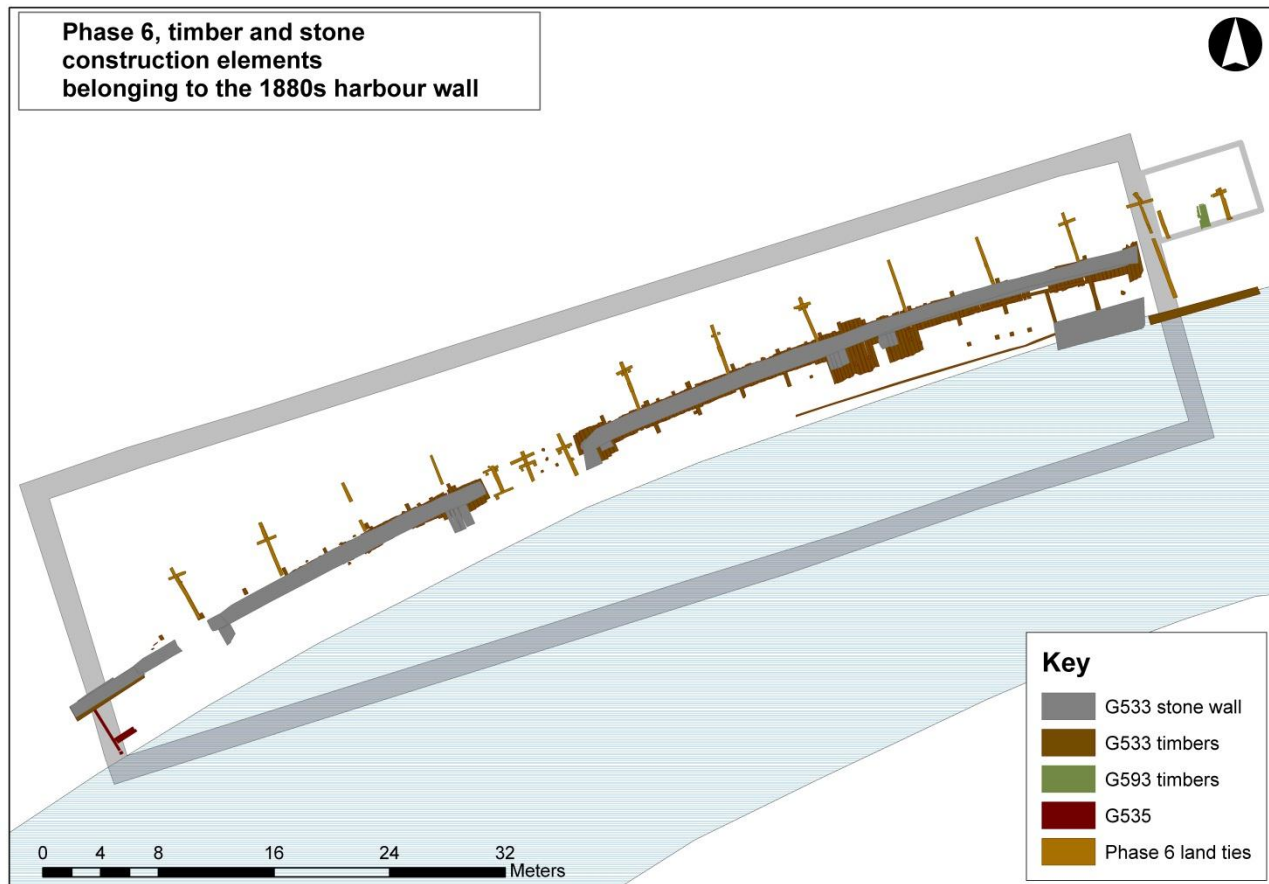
Plan of 1880s harbour wall showing the timber and stone construction elements
